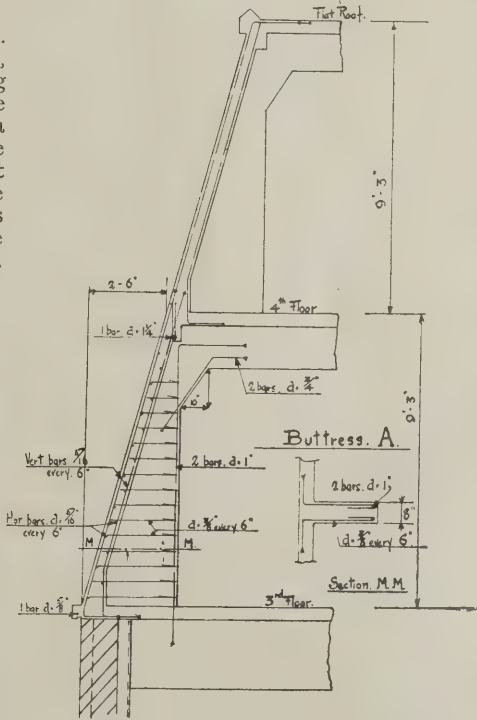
TYPICAL SECTION, MANSARD ROOF.
